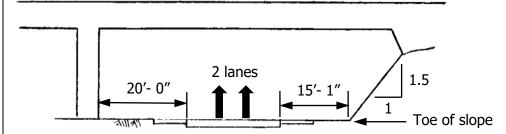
Bridge elevation view of horizontal clearances for a 2-lane highway with 1-way traffic below the bridge.
